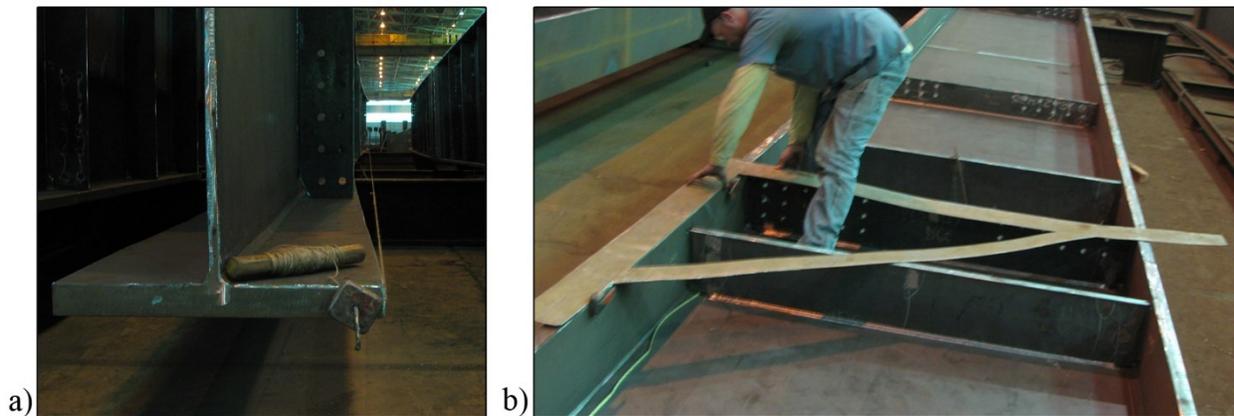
Conventional Measurement Tools Showing a) String Lines and b) Straight-Edges
